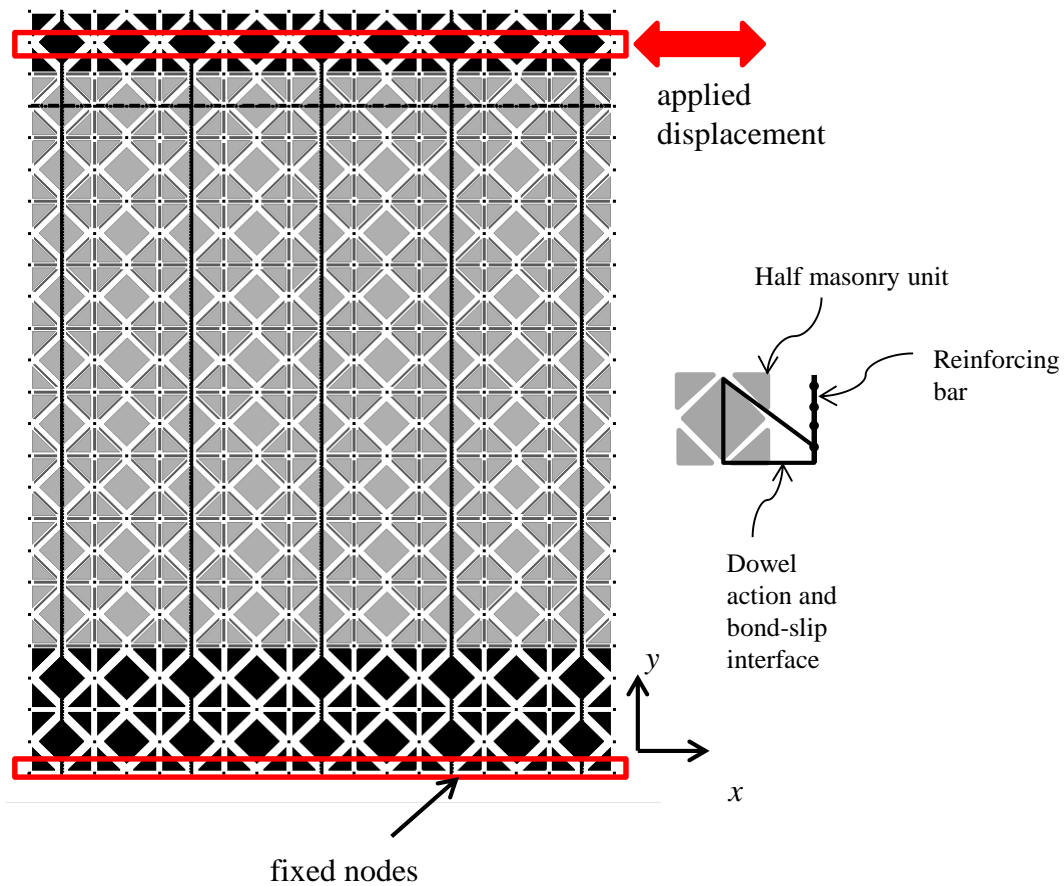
Finite element model of the wall tested by Voon (2007)
